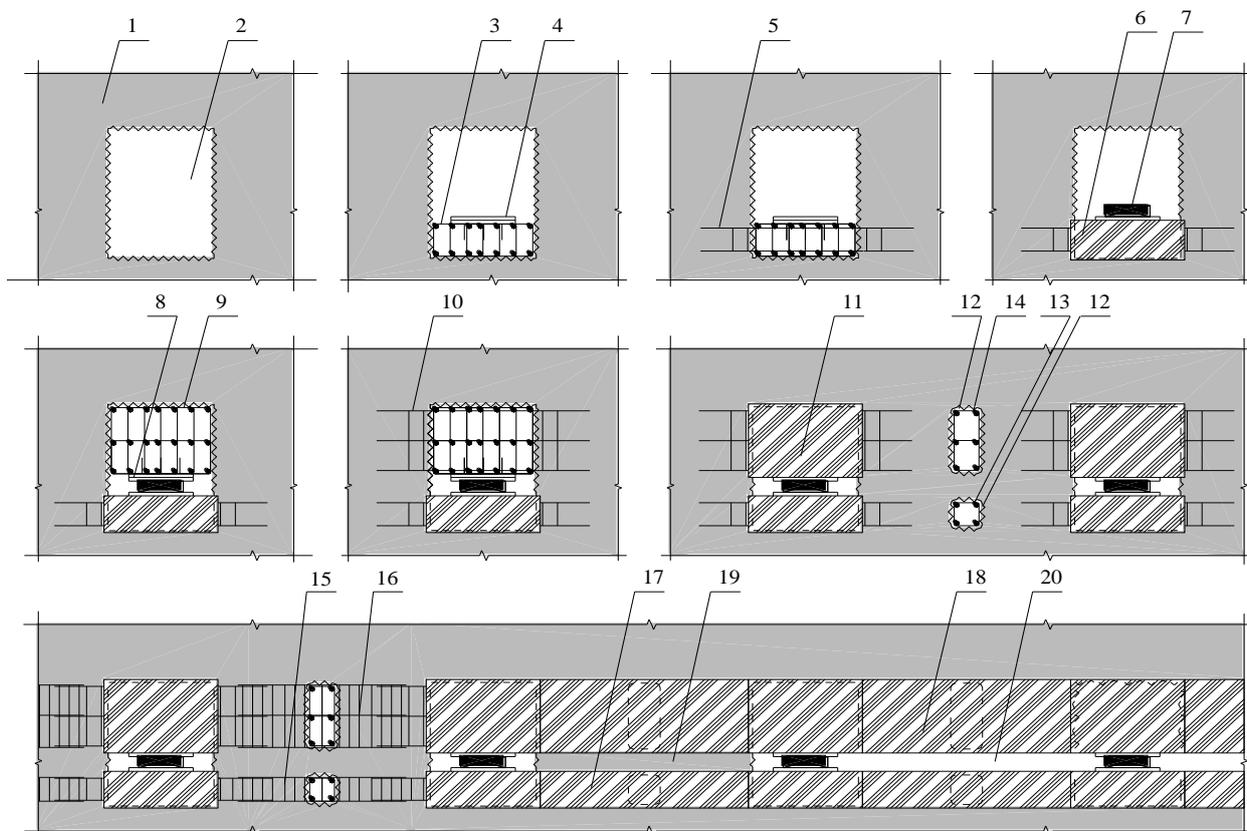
Stages of installation of seismic isolation in the existing buildings with load bearing walls
